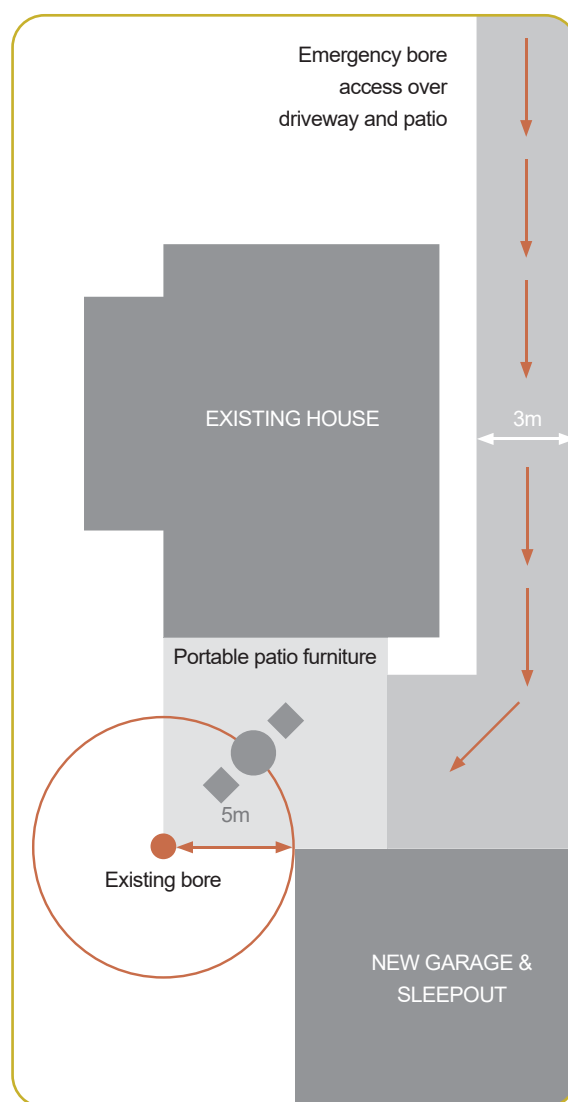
Conceptual example of site layout to maintain access to an existing bore with development of new garage and sleepout.
